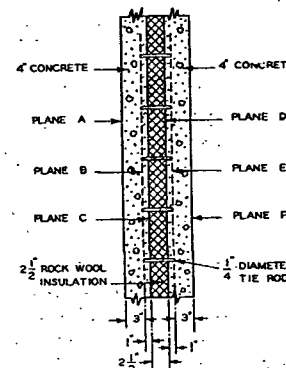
SECTION OF CONCRETE WALL HAVING STEEL TIE RODS AND INSULATION
